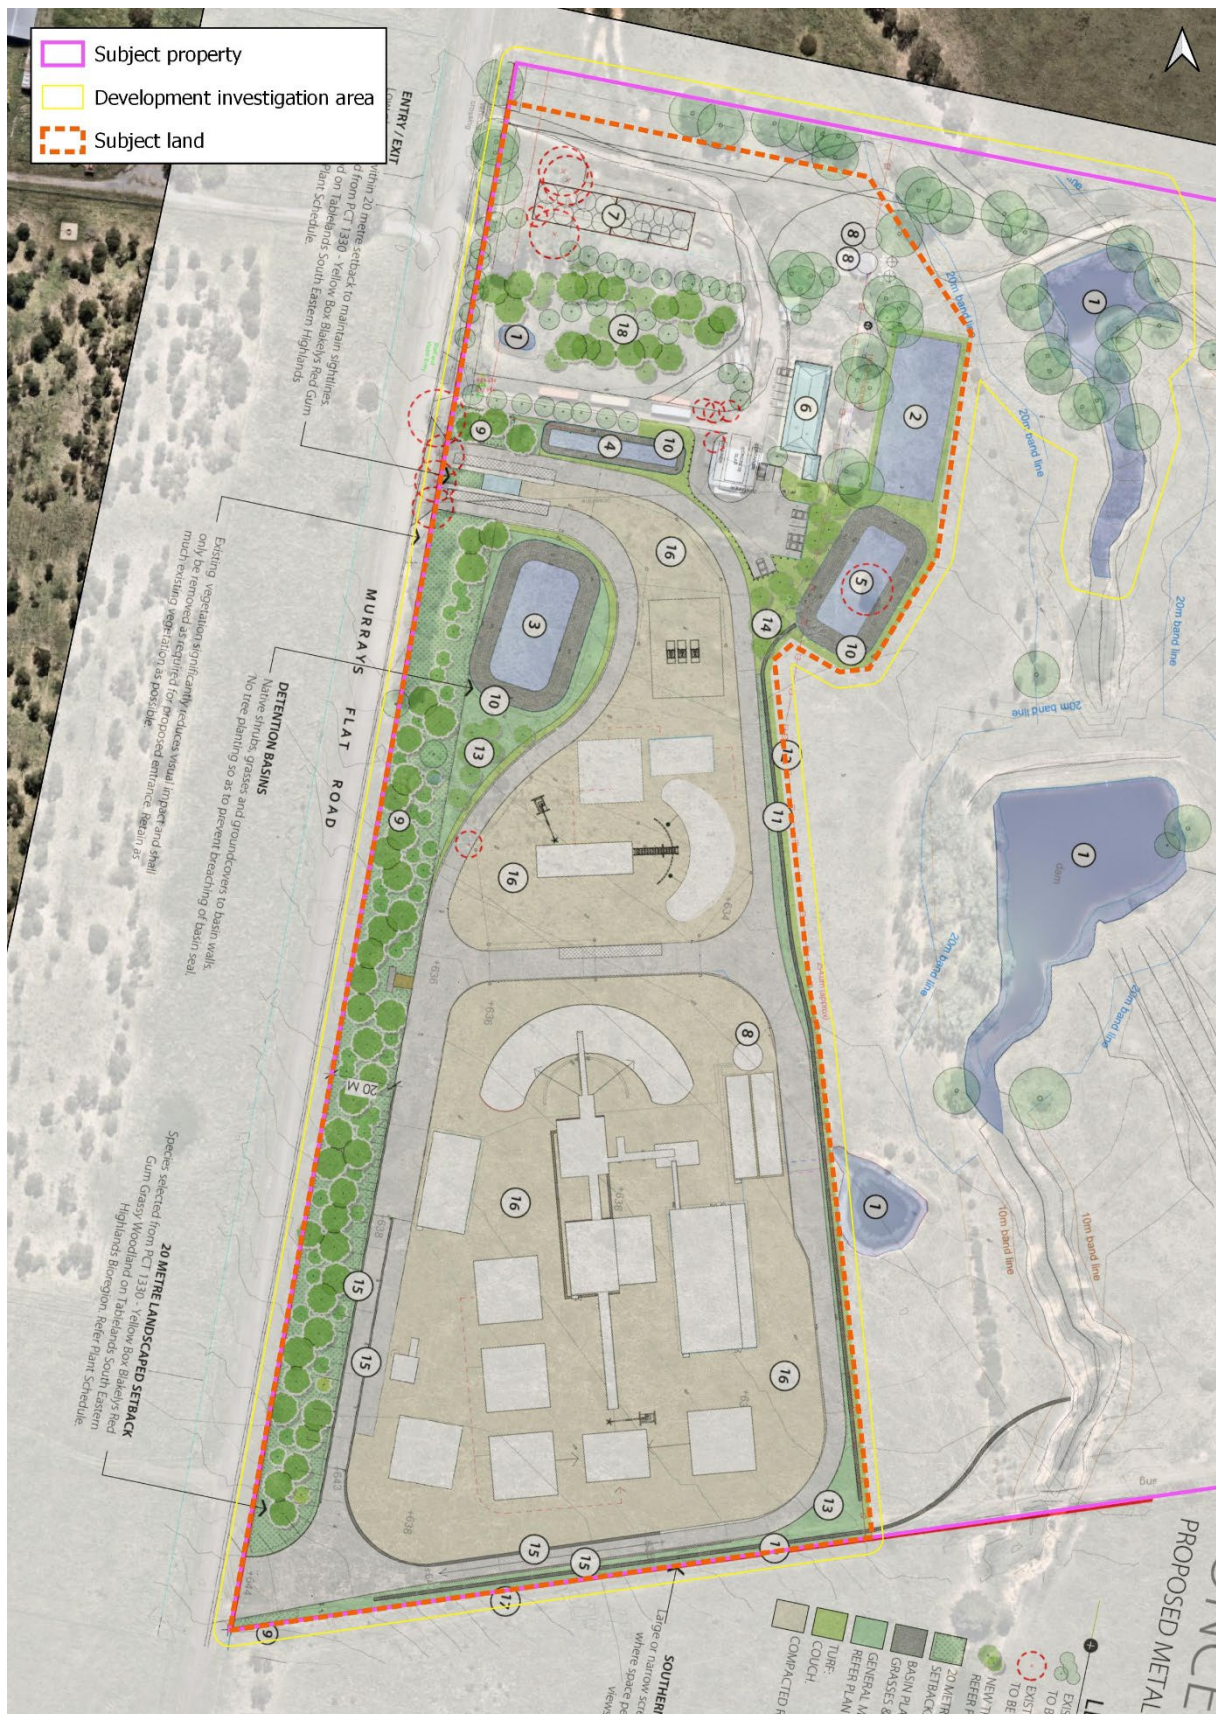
Development layout (Landscape Concept Plan L102 Rev. F) prepared by Terras landscape architects, July 2026).
